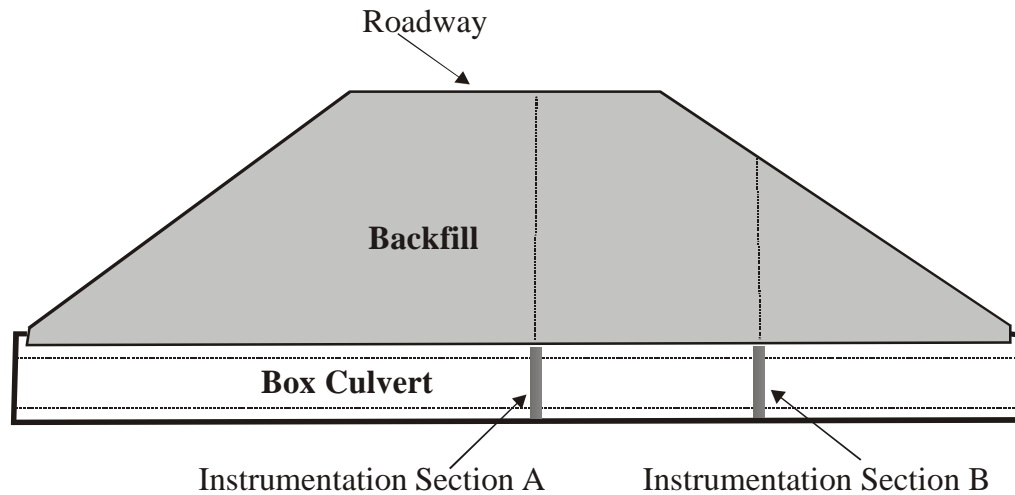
Schematic of Embankment and Culvert Cross-Section
